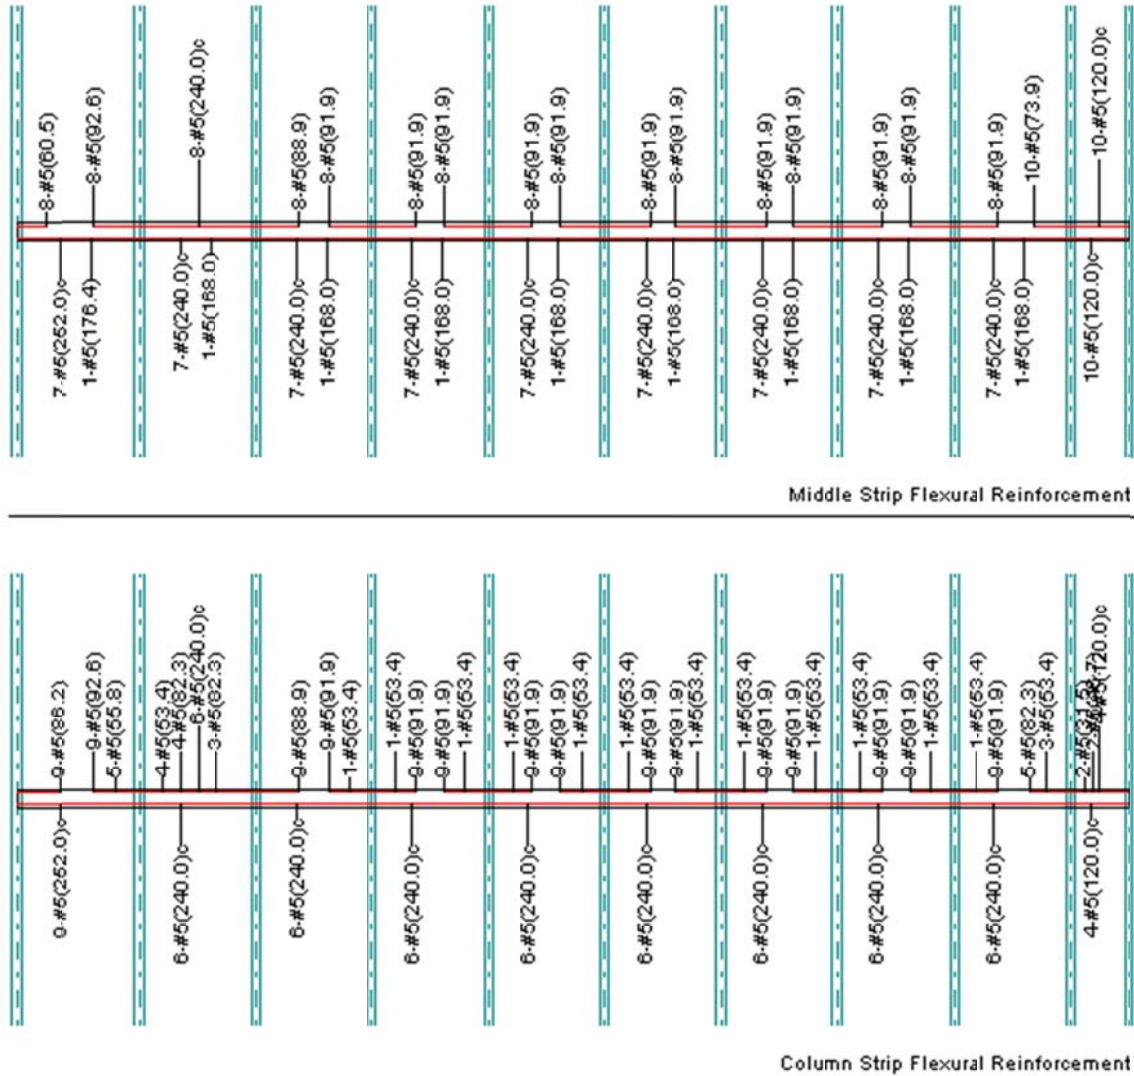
spSlab Column Line 2 Reinforcing Diagram
